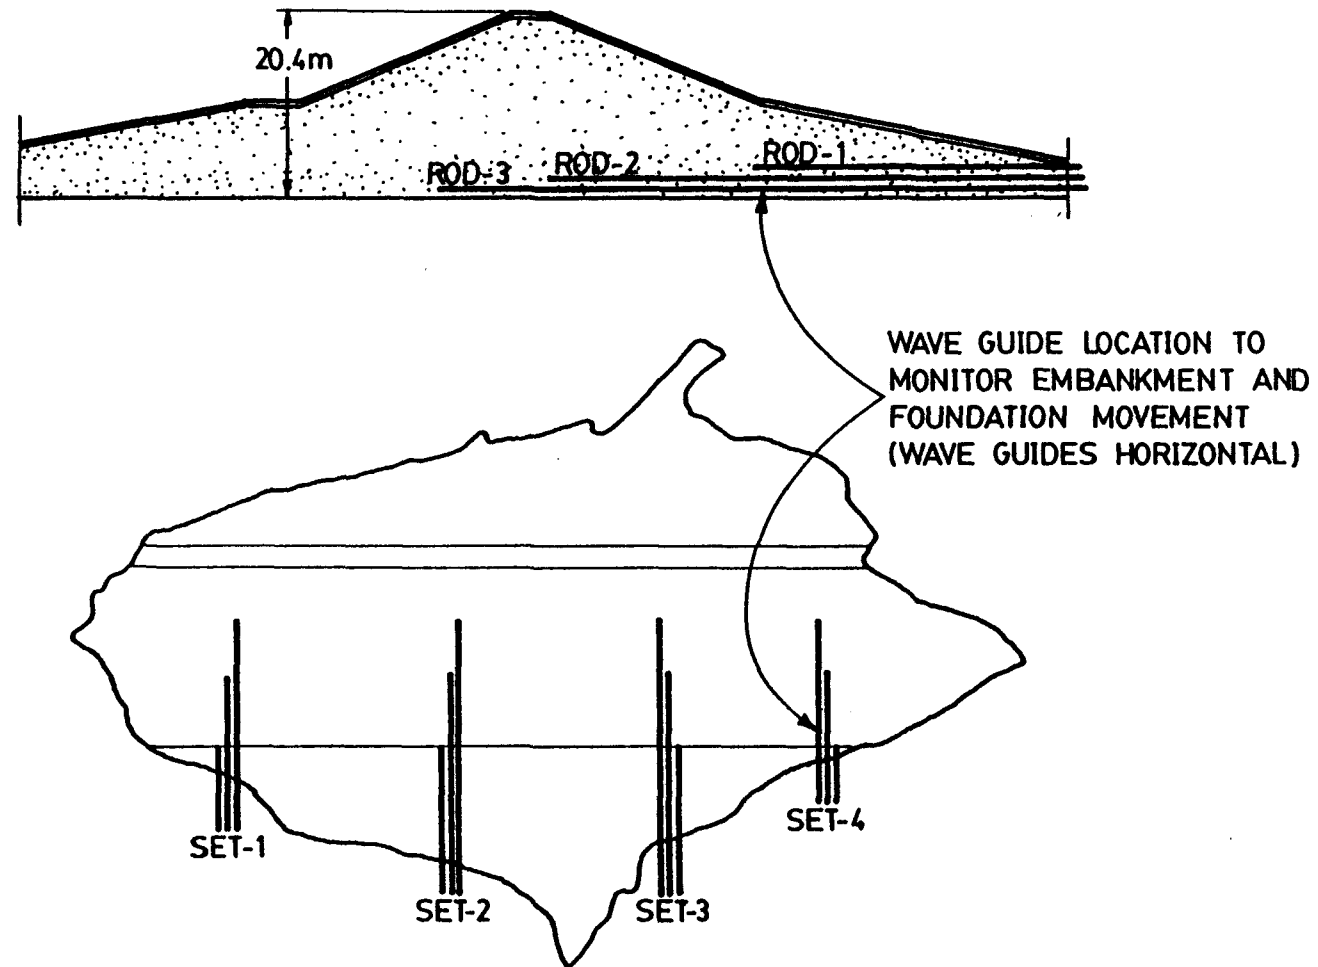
Elevation and plan views of site No. 3 near McCook, Nebraska, showing horizontal wave guide location scheme.
